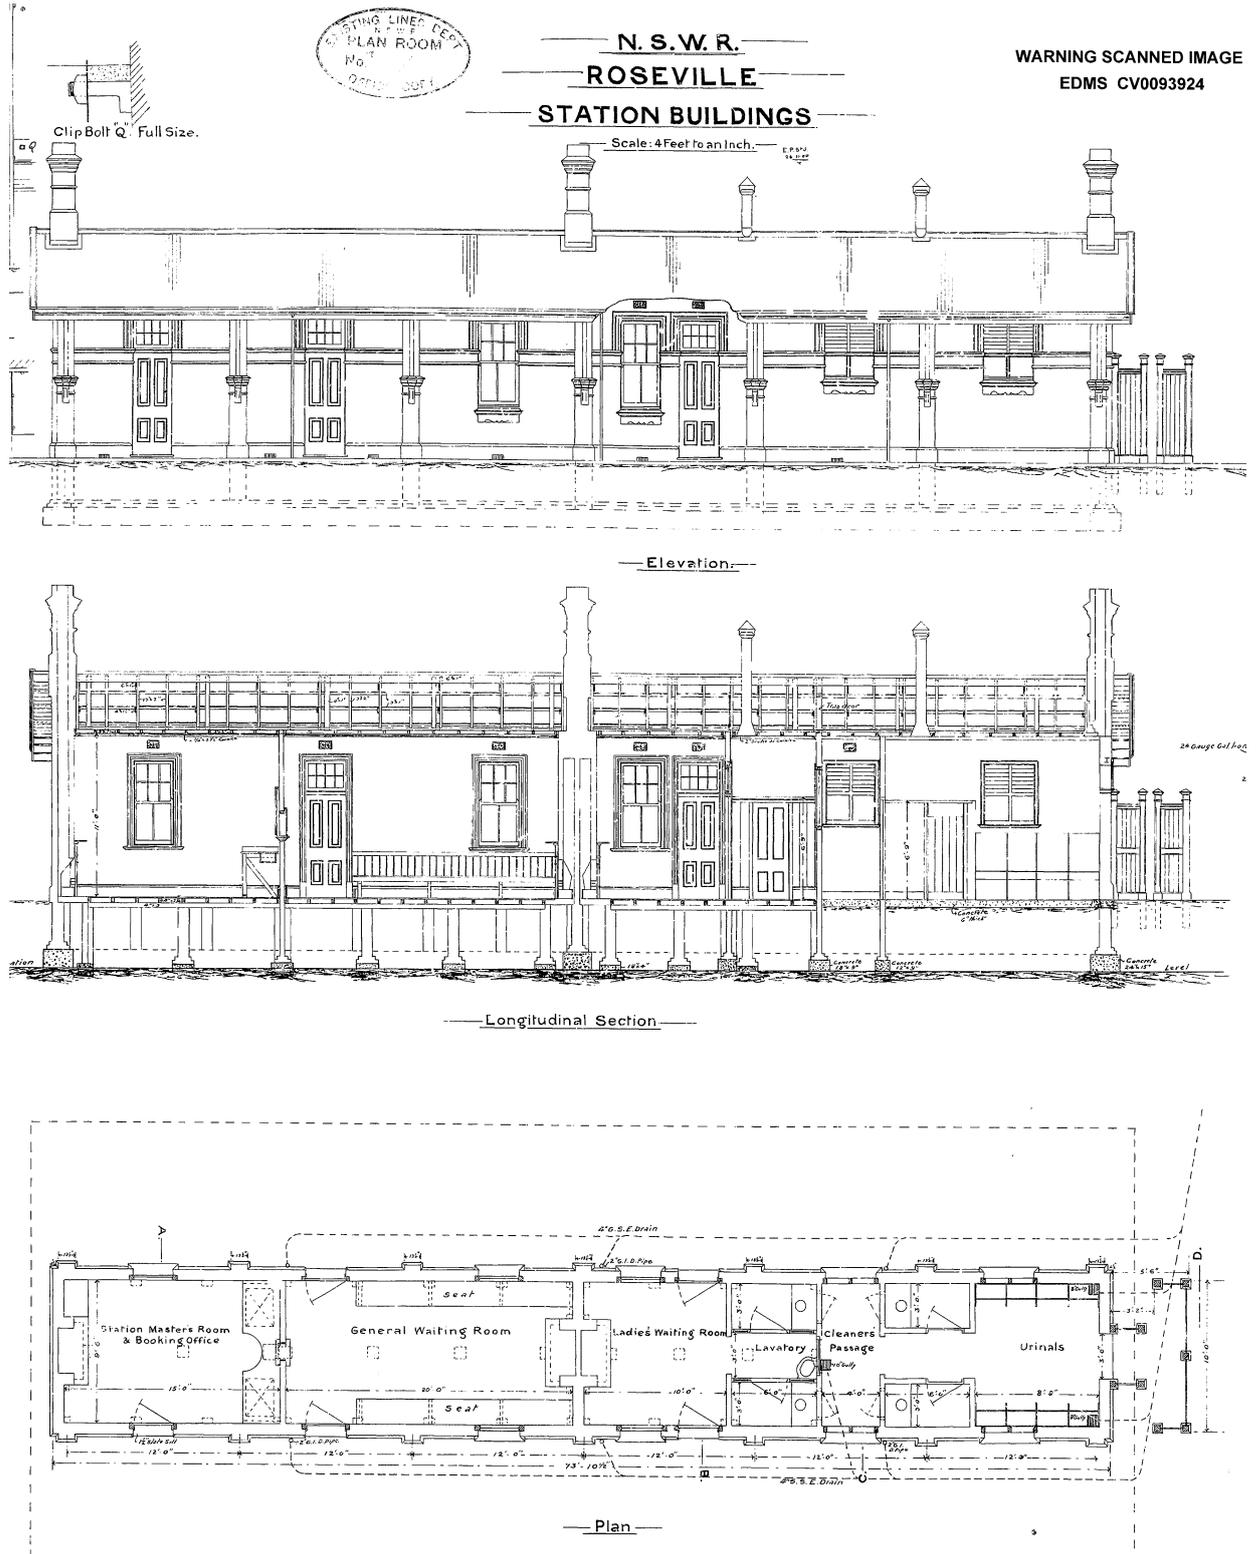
Plan of Roseville Station building. (Source: Transport for NSW)
